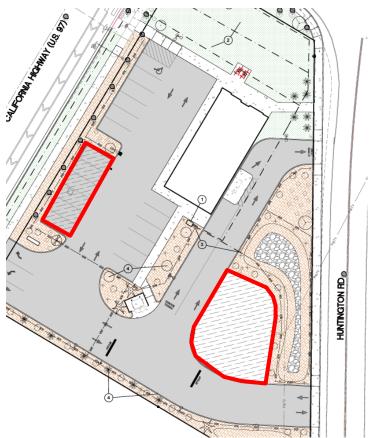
Applicant's site plan, snow storage areas are outlined in red
